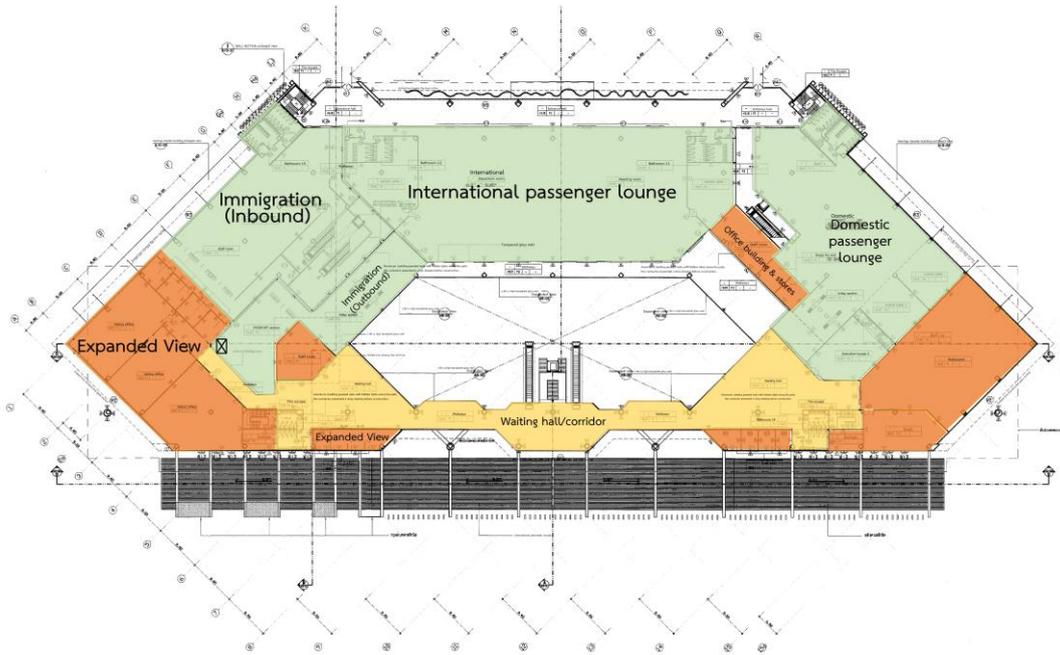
Layout of Terminal 2 (2nd Floor)
